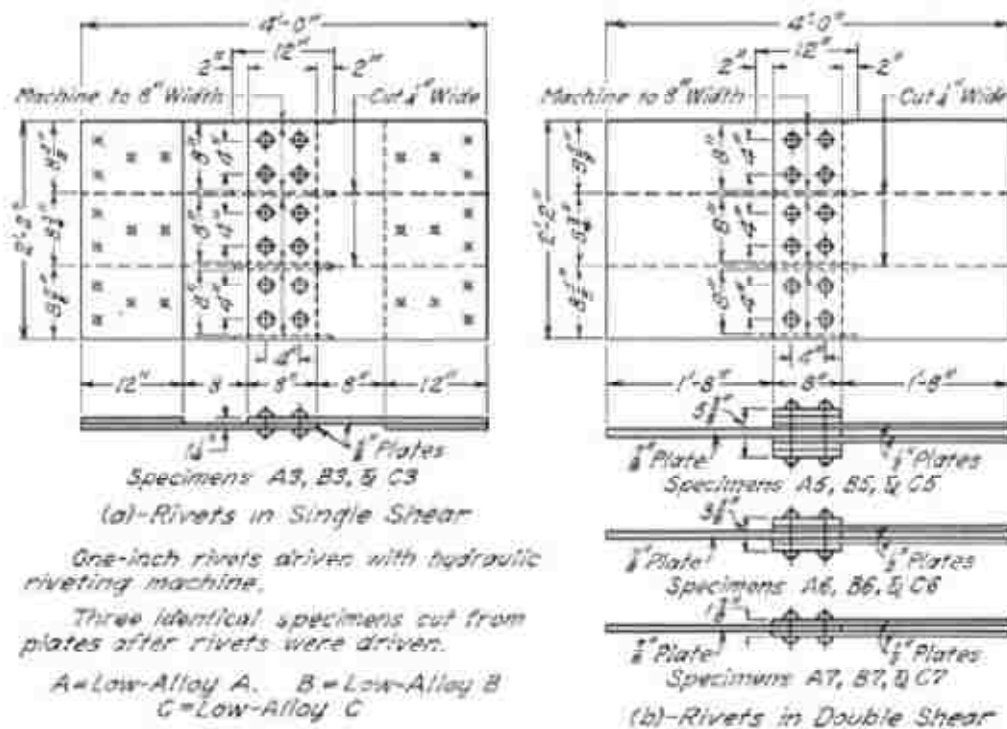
Joints Tested in Single Shear (a) and Double Shear (b) (Wilson, Bruckner, & McCrackin, 1942)
